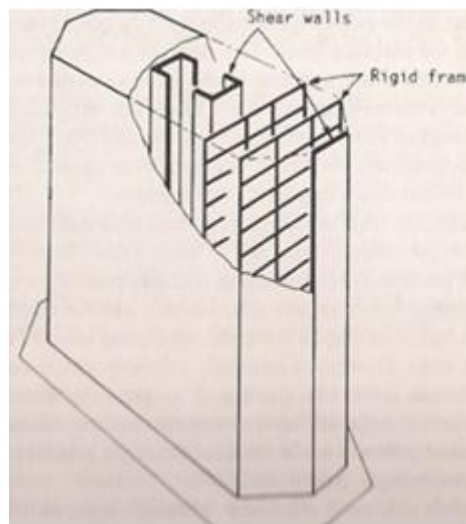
Shear Wall-Frame System (Reproduced from [1])
